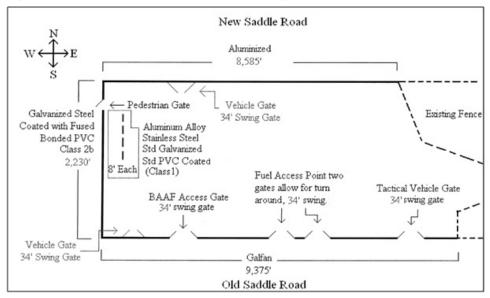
General layout of perimeter fencing and test sections (not to scale).
